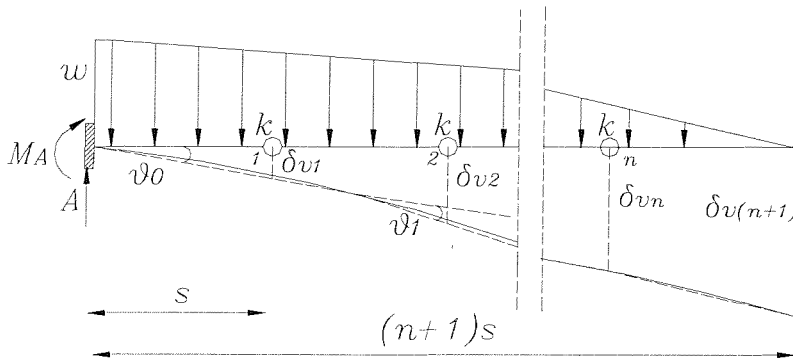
Cantilever beam subject to triangular loading with n rotational springs.
